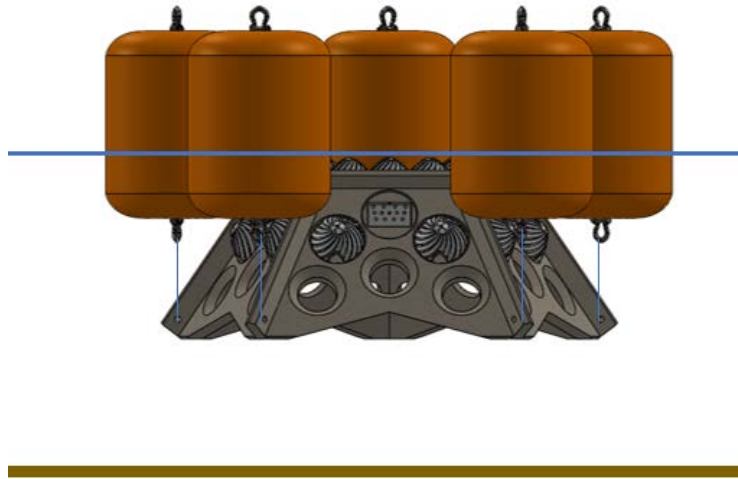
A Drawing of a Backreef RMS Unit Supported with Air Filled Lift Bags, to Enable Towing Into Shallow Water
